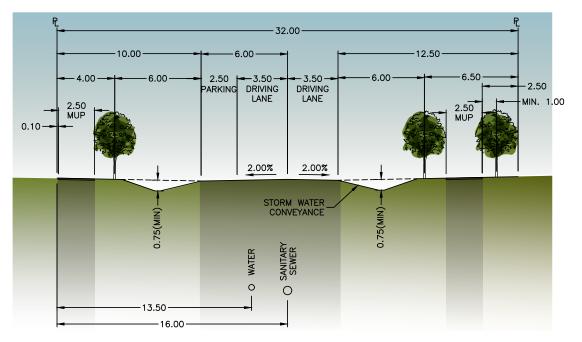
Grand Boulevard -- Ulndivided Undivided (Parking on one side)
